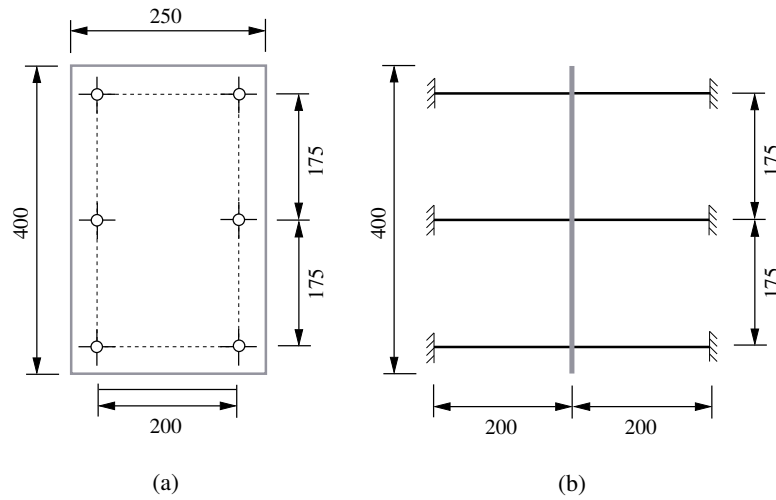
Nominal dimensions of the adaptive facade module. (a) Front view (b) Lateral view (all dimensions are given in mm).
